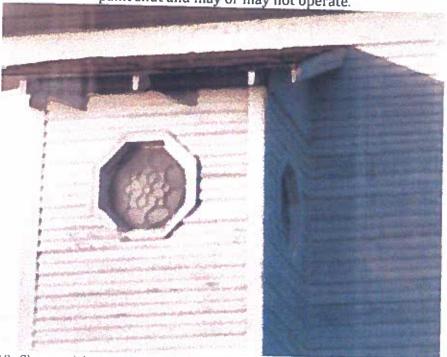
Shower/closet attached to south side of 2nd floor. The windows are fixed and can not be opened.
